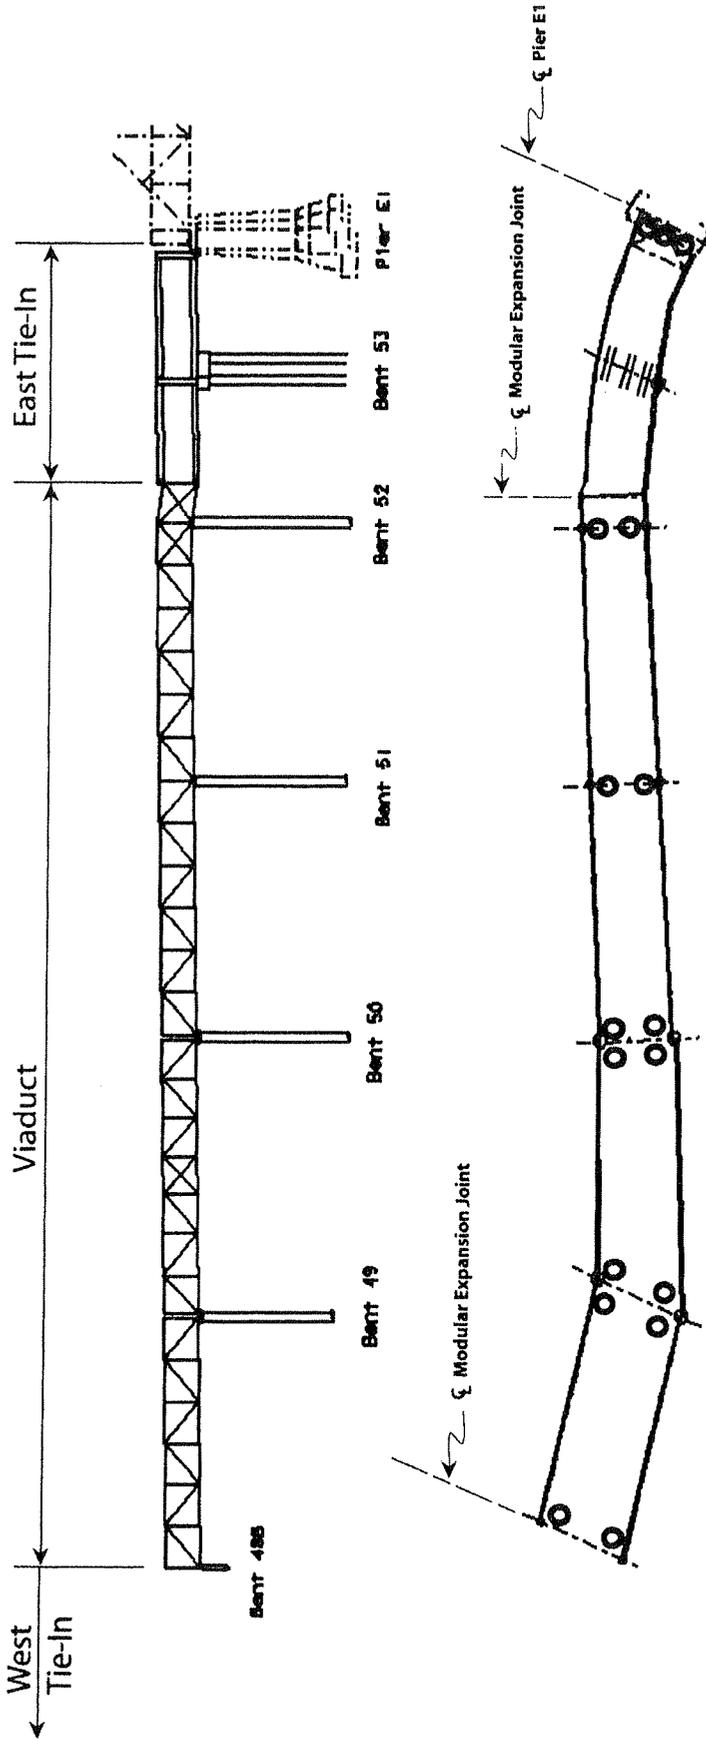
Schematics Elevation and plan-Articulation of Temporary Bypass Structure
